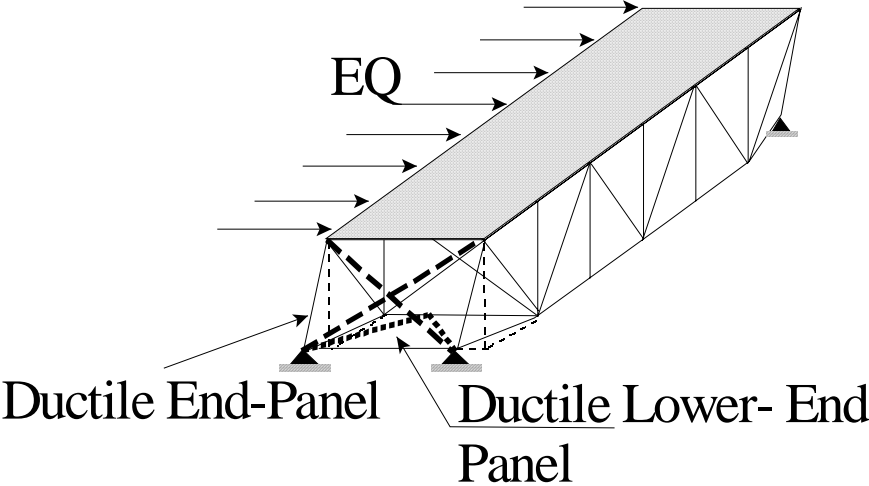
(b). Steel ductile retrofit in a deck-truss bridge
